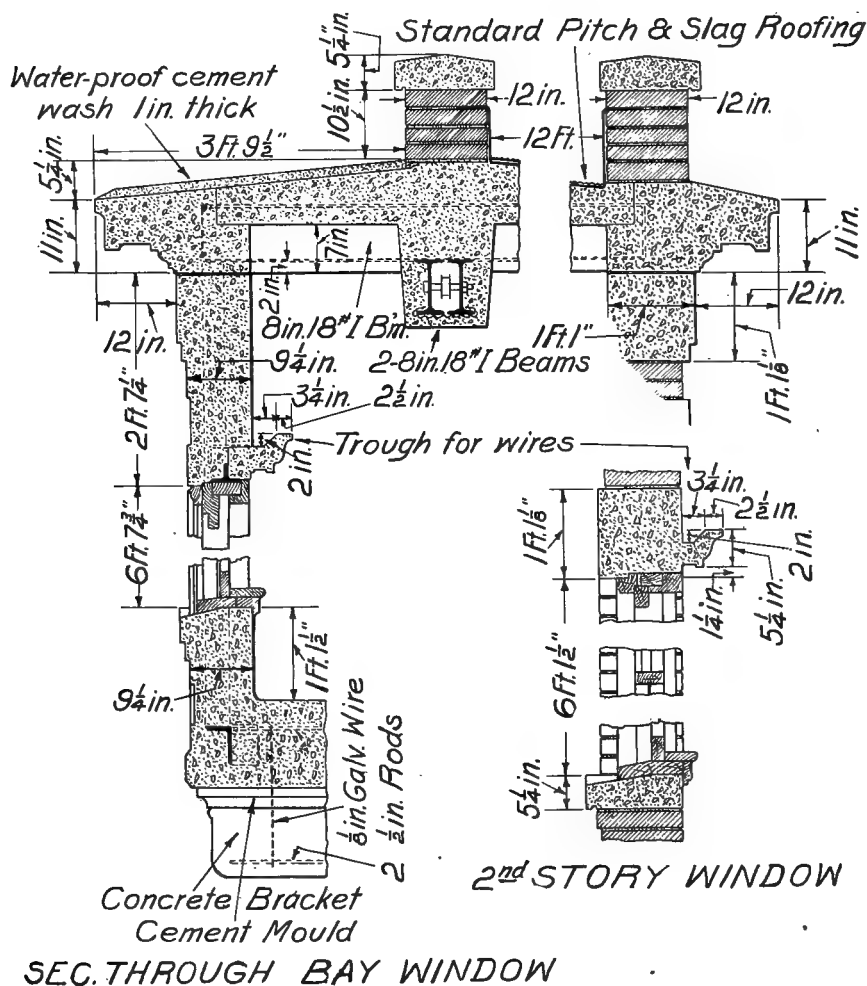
DETAILS OF CONSTRUCTION, KINGSBRIDGE SIGNAL TOWER, N. Y. C. & H. R. R. R.
